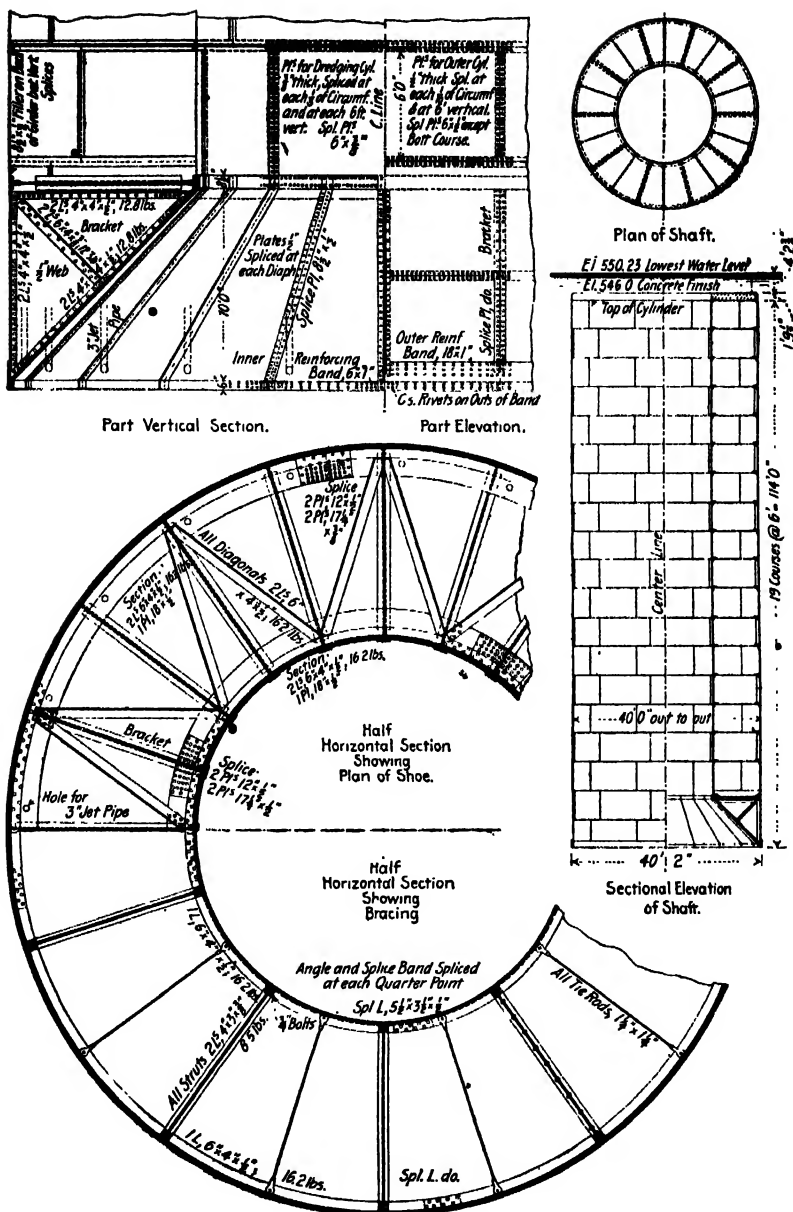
Details of Open Caisson for Pivot Pier of Omaha Interstate Bridge. Designed in 1902.
